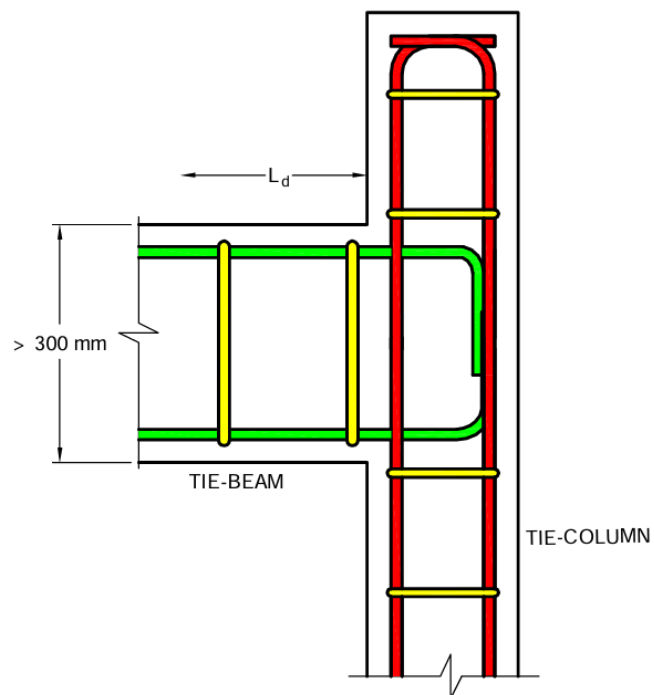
CONTINUITY OF TIE-BEAM REINFORCEMENT THROUGH JOINT
